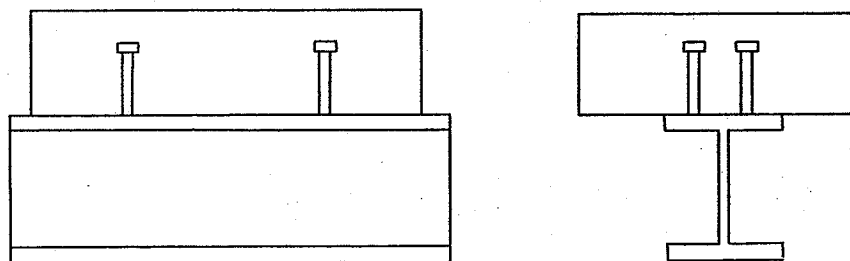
Typical Push-out Test Specimen (Type 2)
